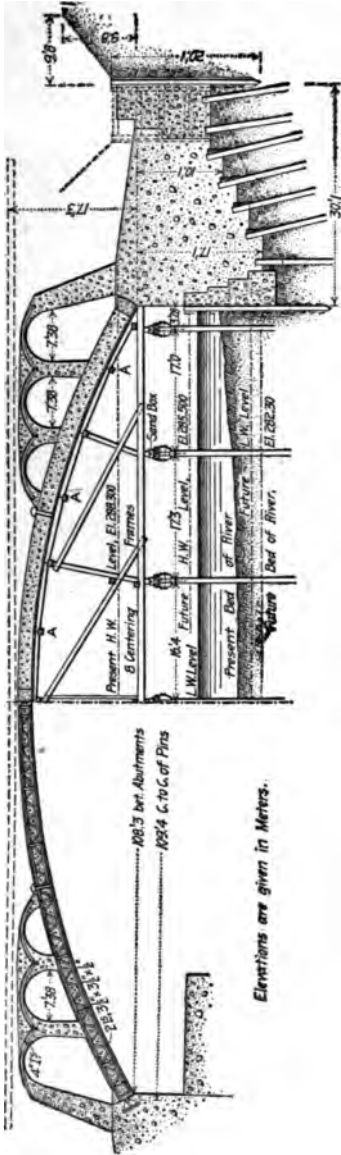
Melan Hinged Arch Bridge at Laibach, Austria.
